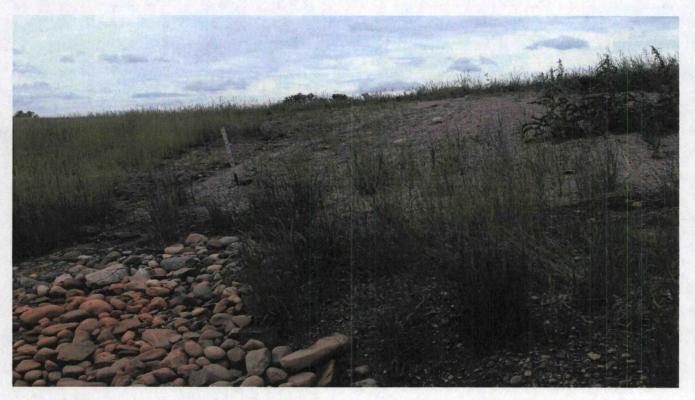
Photo shows erosion on the slope above the rip rap at the outlet of the south pore water discharge pipe.
